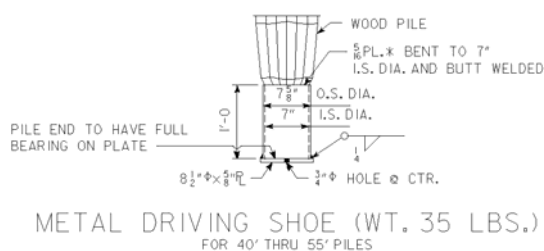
Metal driving shoe for timber piles 40 to 55 feet (12.190 to 16.760 m) in length
